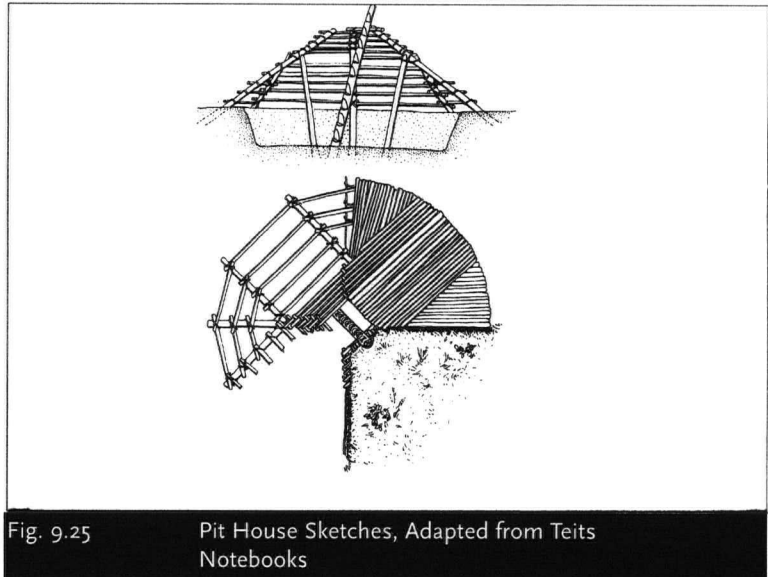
Pit House Sketches, Adapted from Teits Notebooks
